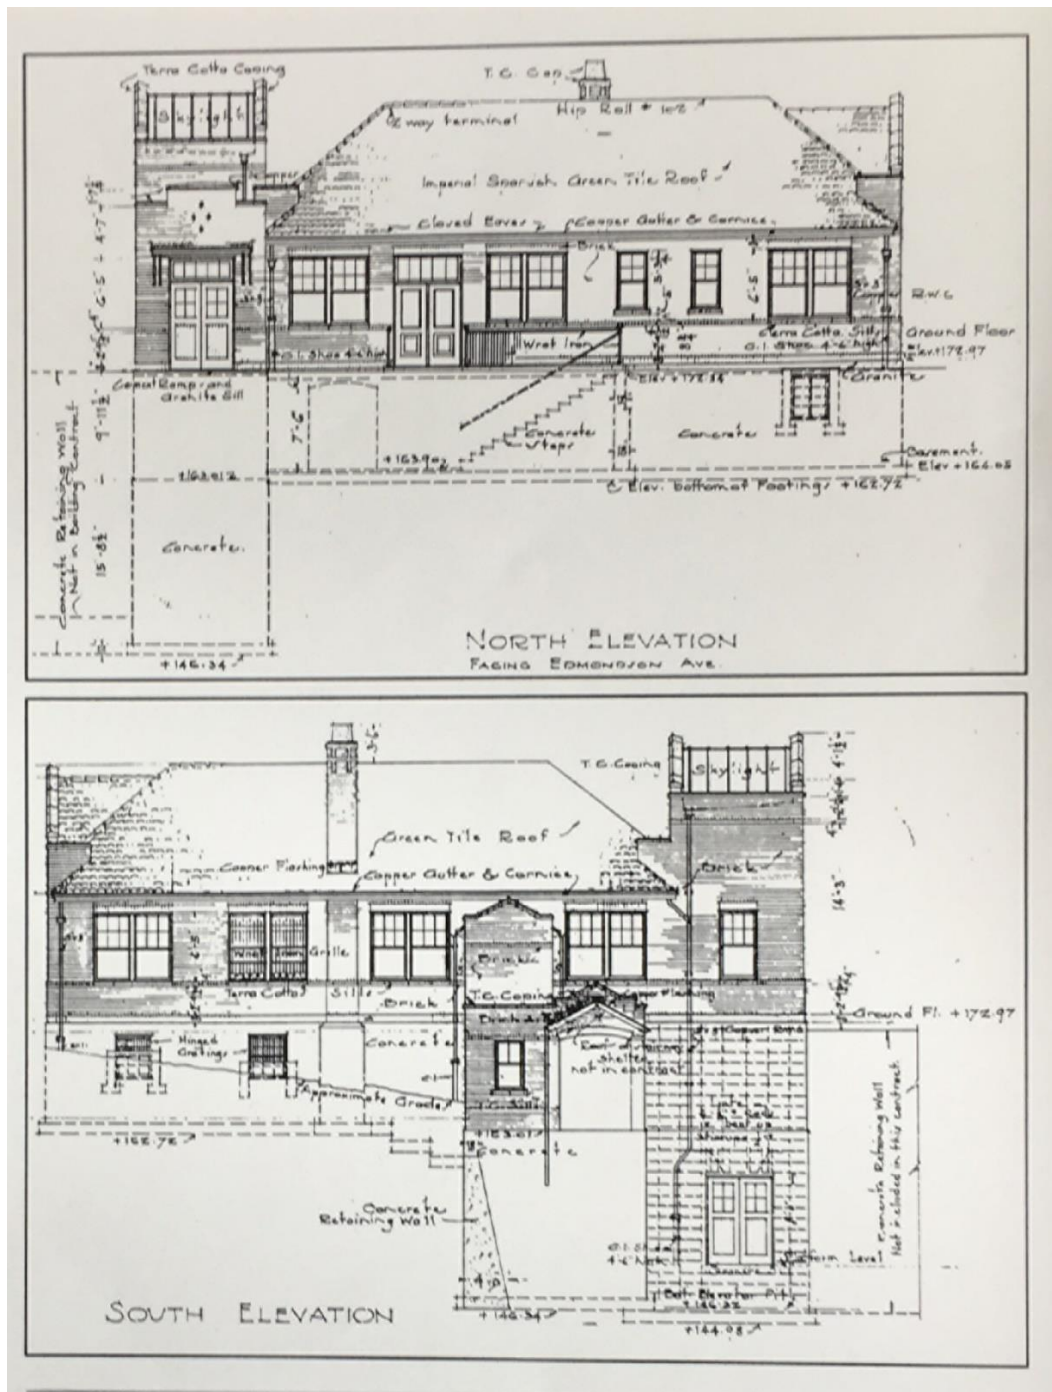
Revised elevation drawings by PRR Architect William Holmes Cookman for construction of the Edmondson Avenue Station. Note the staircase beneath the sidewalk in front of the north elevation leading to the north/south passageway under the station, the central chimney in the south elevation, and the elevator shaft in the east wing. Frank A. Wrabel, "Terminals, Tunnels and Turmoil: The History of Pennsylvania Station – Baltimore," *The Keystone*, 34.
